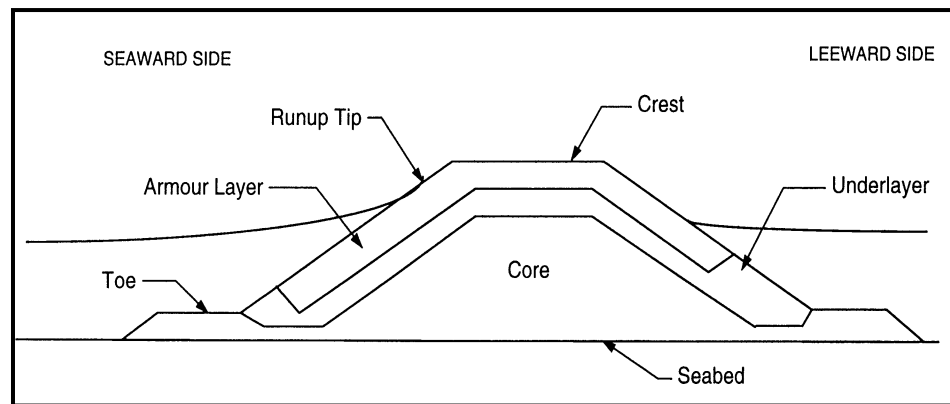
Cross Section of a Typical Rubble Mound Breakwater (Palmer and Christian, 1998)
